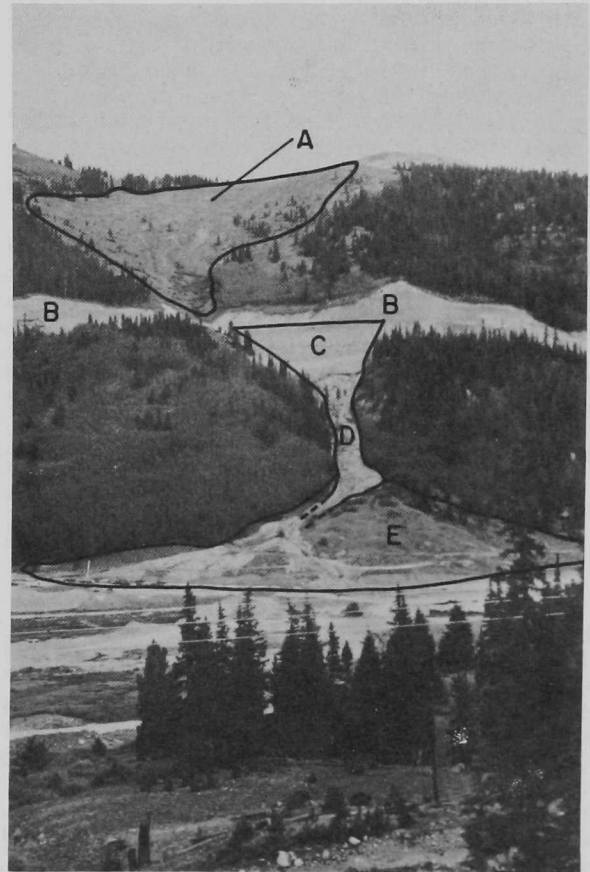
View looking west of debris-flow and fan about 10 km north of Climax, Colo. Area A is the source area for debris flows that traveled down the drainageway to construct the debris fan (Area E). A new road constructed across the drainageway has modified the natural system. Area B is a roadcut and Area C is an embankment. Part of the embankment (Area D) mobilized into a debris flow and traveled over the left side of the debris fan.
